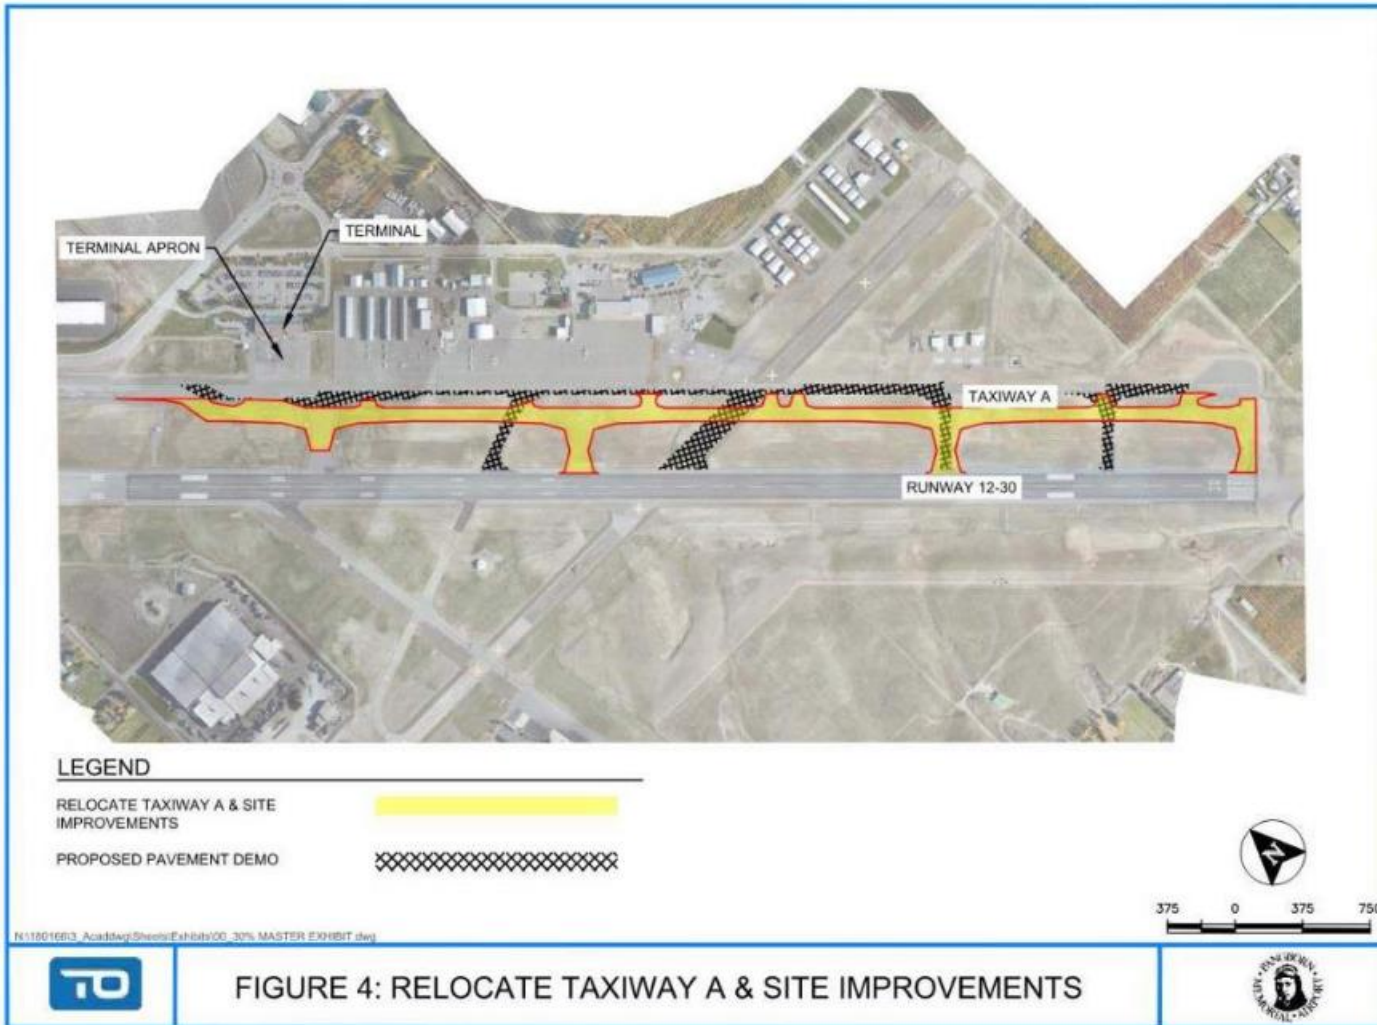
Relocate Taxiway A and Site Improvements, adapted from Proposed Improvements Exhibit, (dated 1/29/21)
